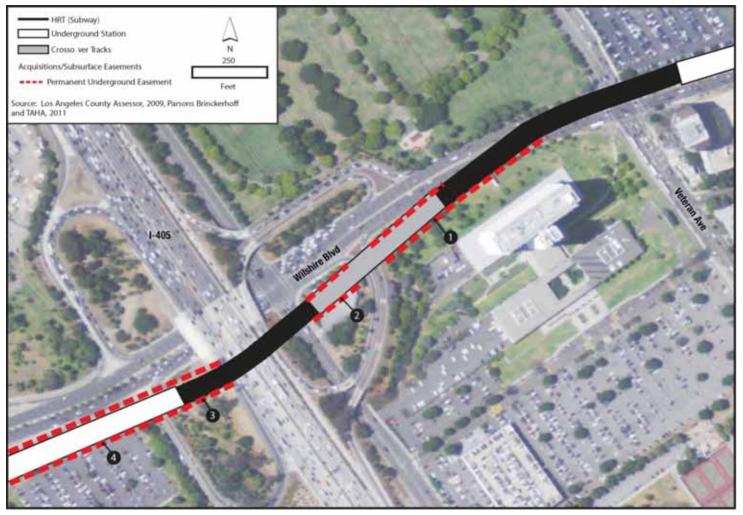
Permanent Underground Easements from Westwood/UCLA On-Street Station to Westwood/VA South Station
